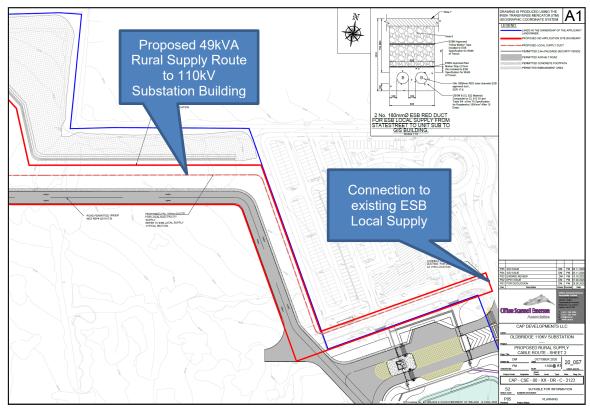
Proposed Rural Supply Route – Sheet 2
